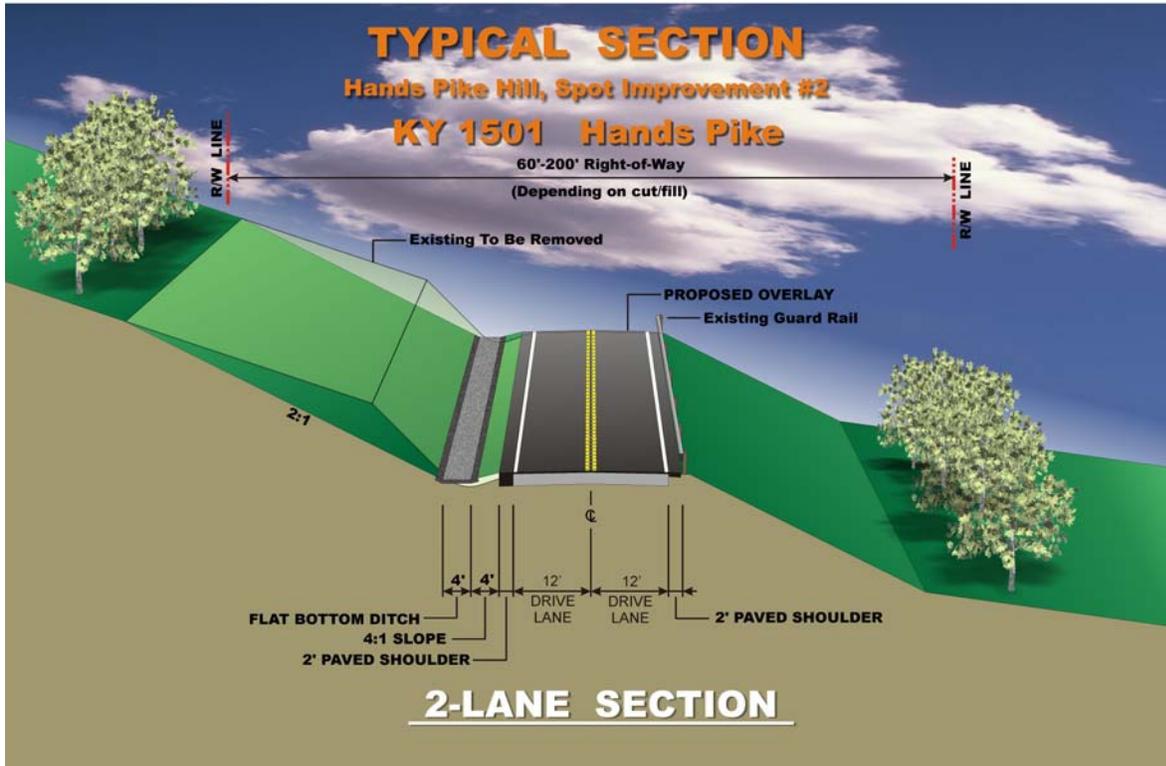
Analysis Section 1—Typical Section for Short-Term Reconstruction
